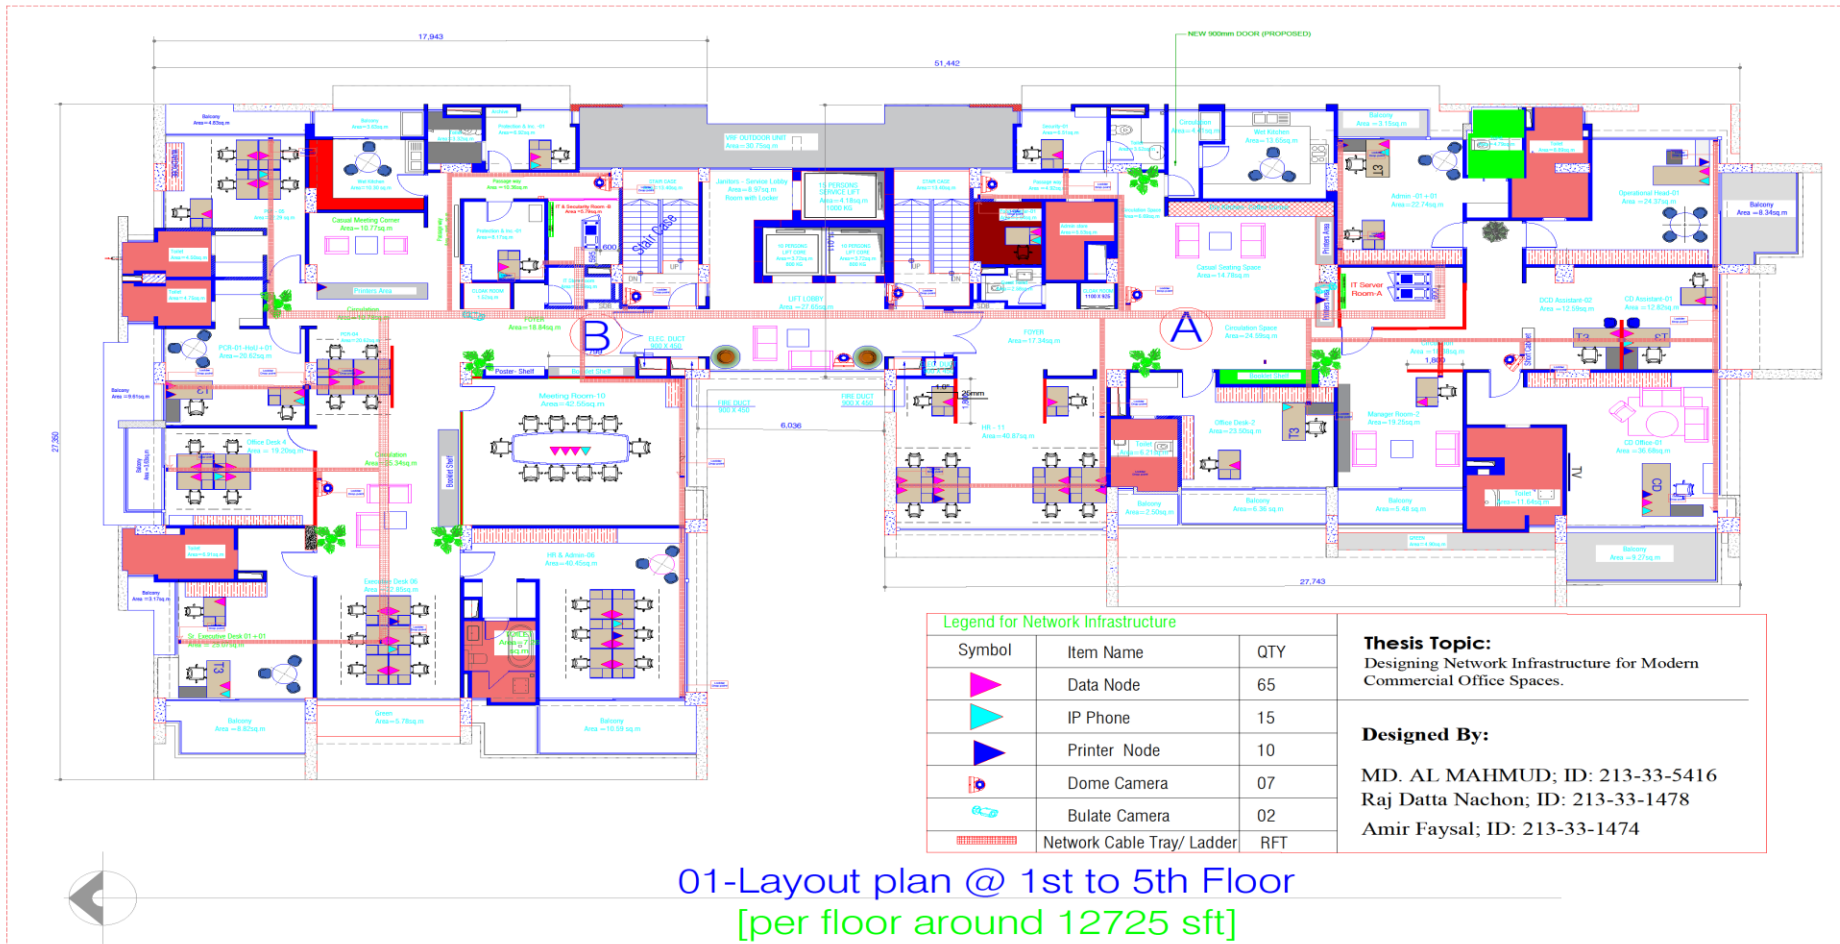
Prepare Office Floor Network Distribution Path Layout-02.
